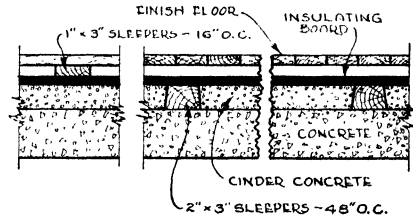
Floating Floor Construction on Structural Insulating Board over Concrete Slab
